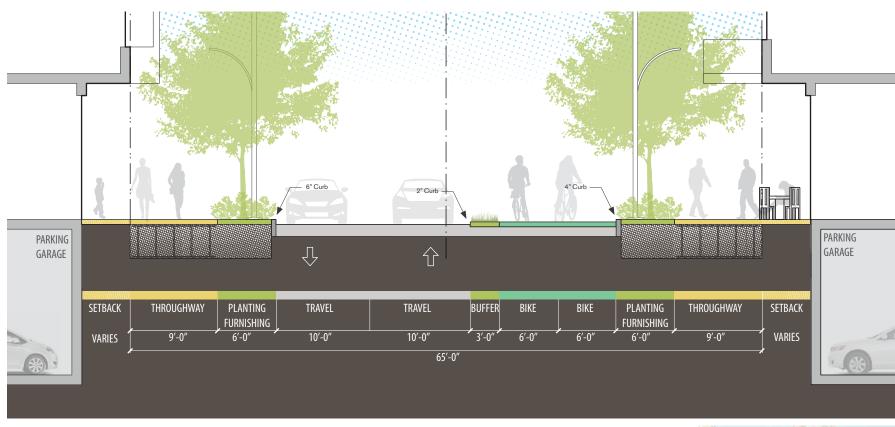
NEW HUDSON STREET SECTION - TYPICAL
